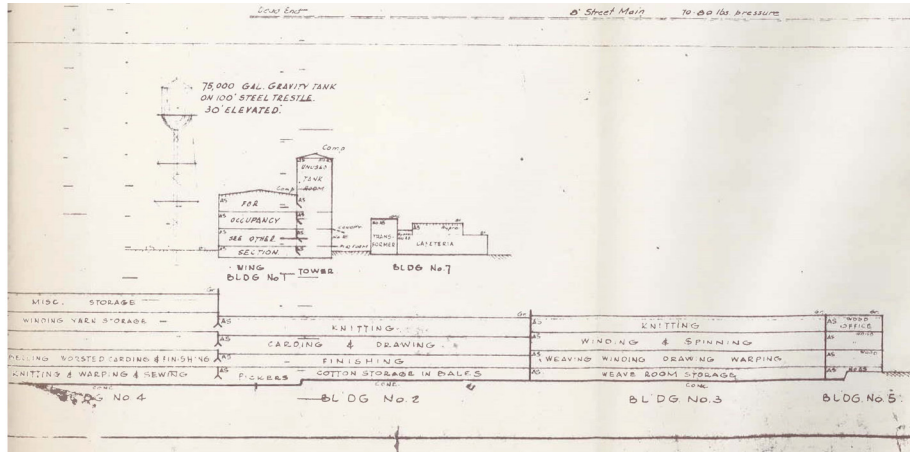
Portion of Plan & Elevation Reference Drawing, 1952
